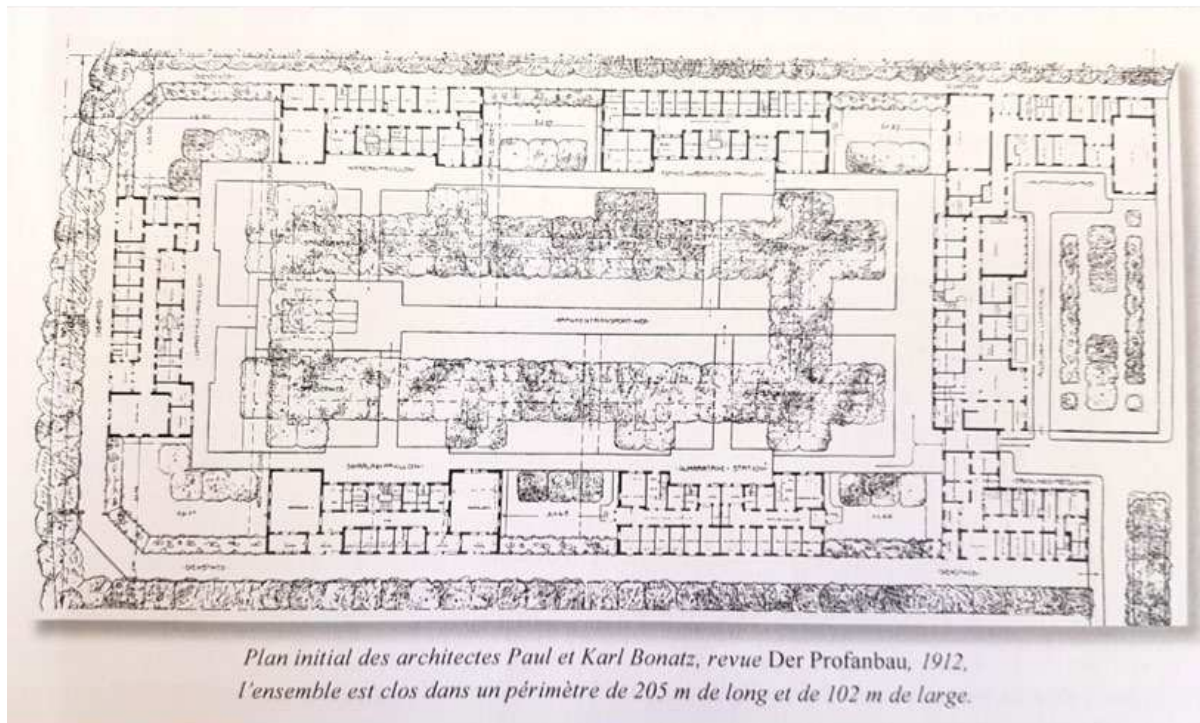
Floor plan of the six pavilions of the children's clinic.¹⁶⁷
